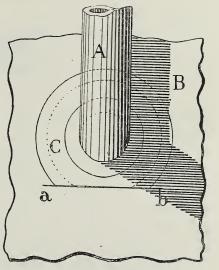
Fitting a leaden pipe to a vertical wall, inaccessible from the back.
